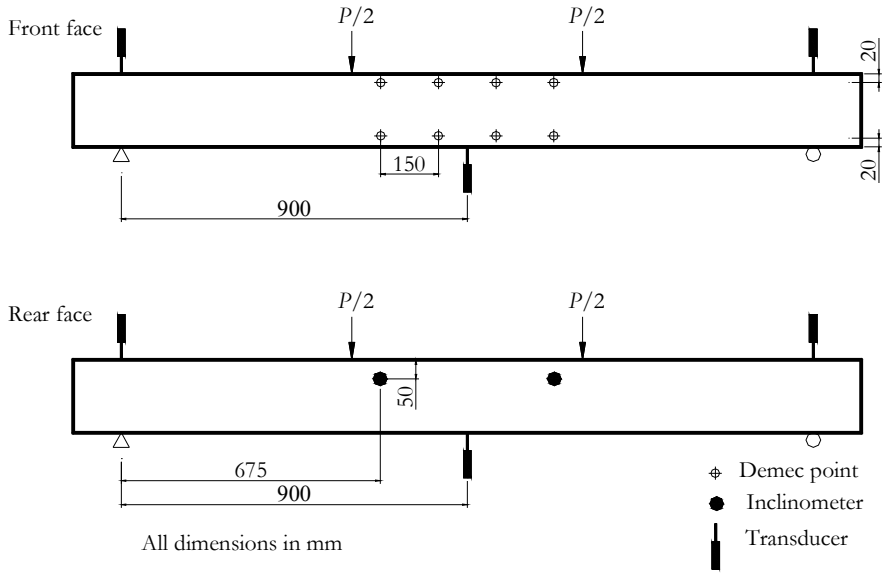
Instrumentation details for beam C2-316-D2-A.
